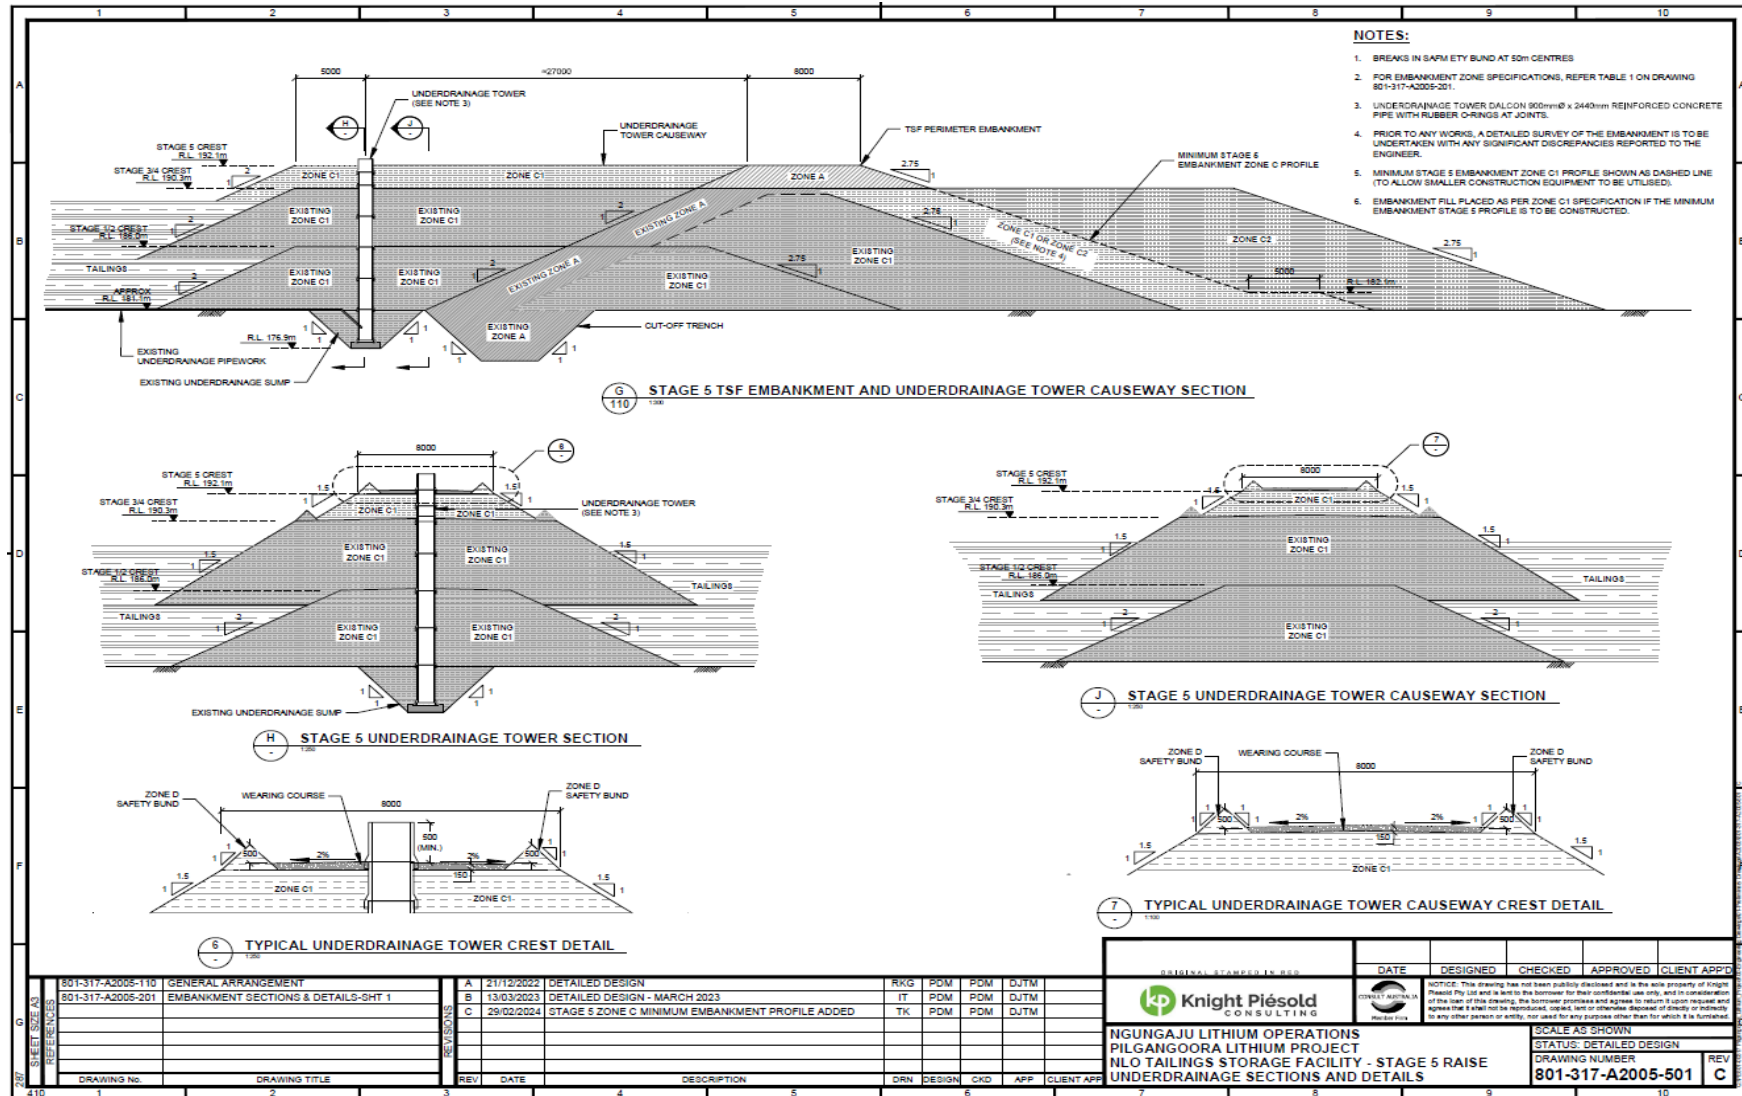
NLO TSF raise 5 underdrainage decant tower details
